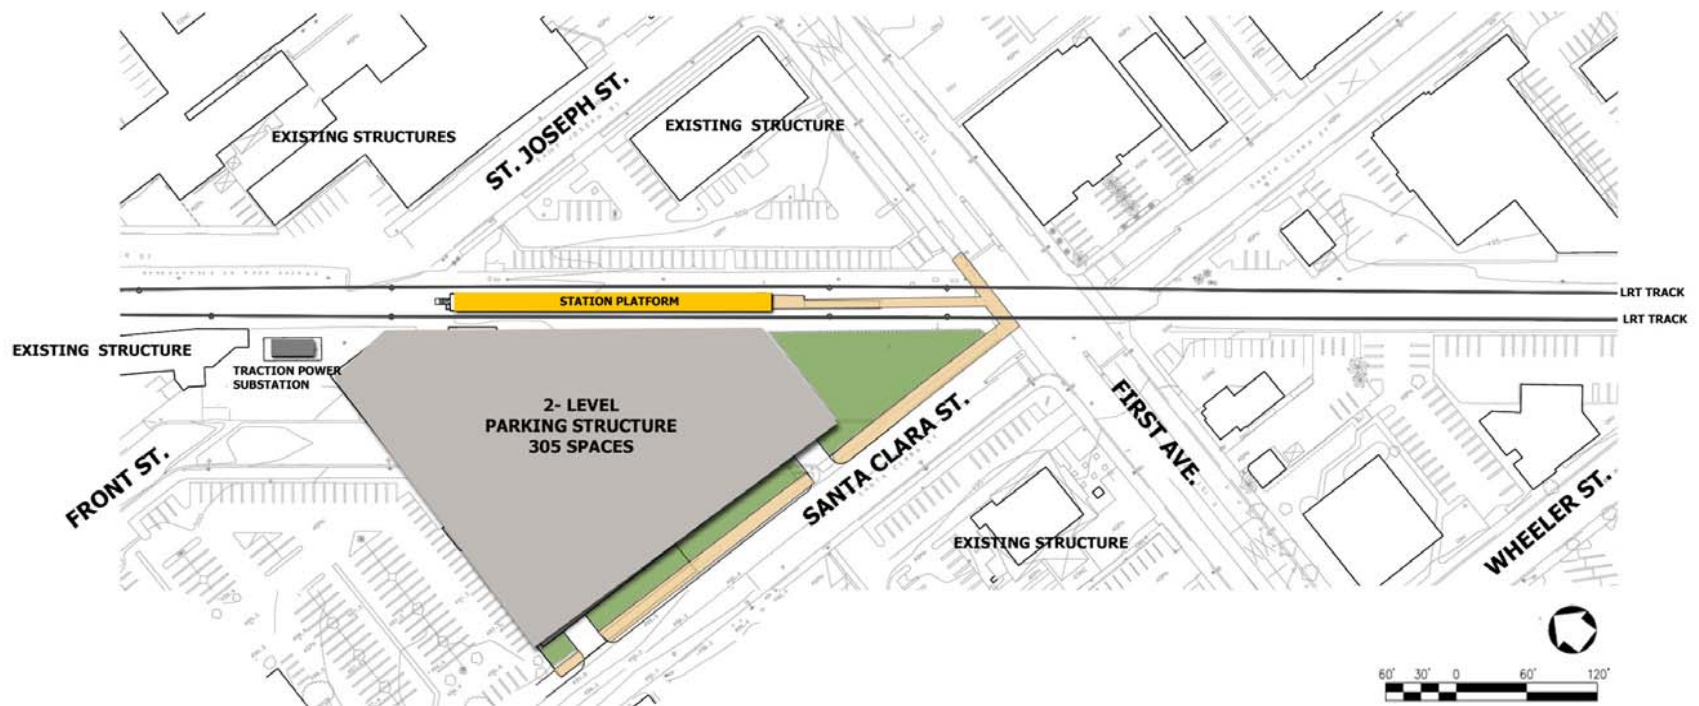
Site Plan: City of Arcadia Station, Option B
